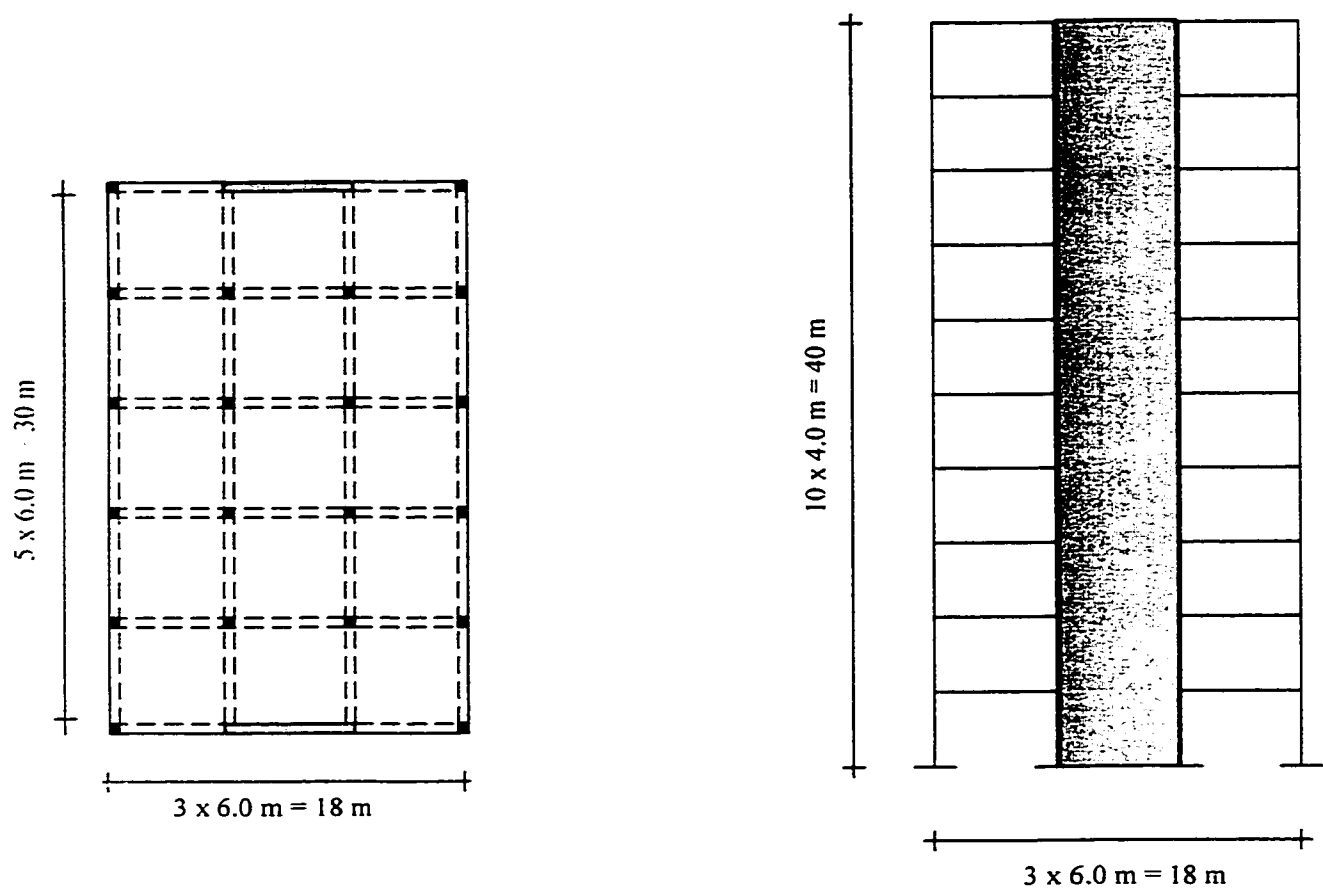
Typical plan and elevation for 5-, 10- and 15-storey shear wall analytical models
